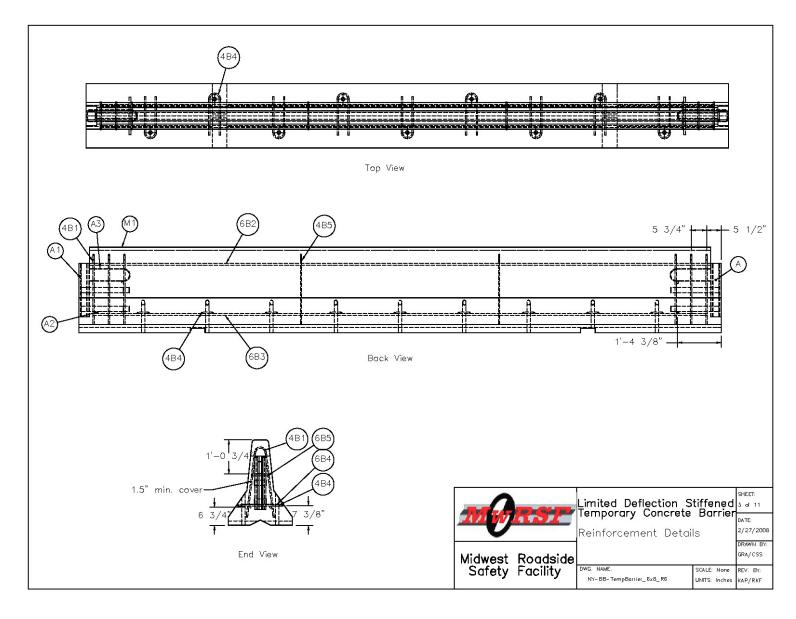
Temporary Concrete Barrier Reinforcement Details (English), Test NYTCB-3
